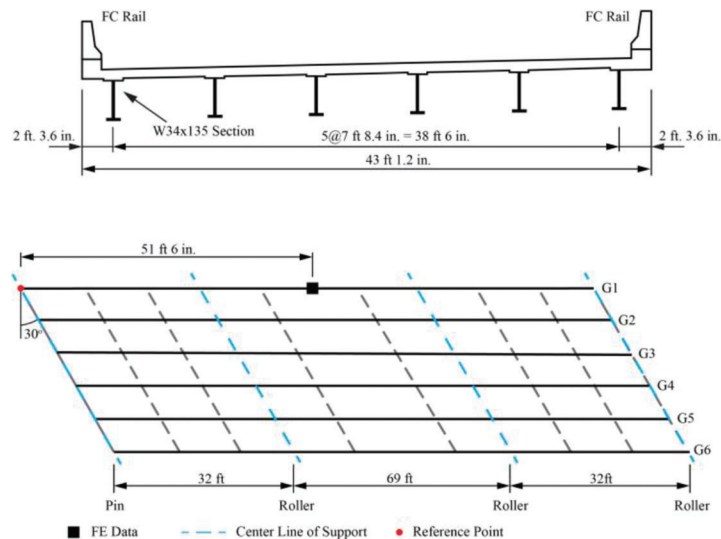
Cross-section and frame plan of the modified three-span continuous steel girder bridge with 30-degree skew angle.
